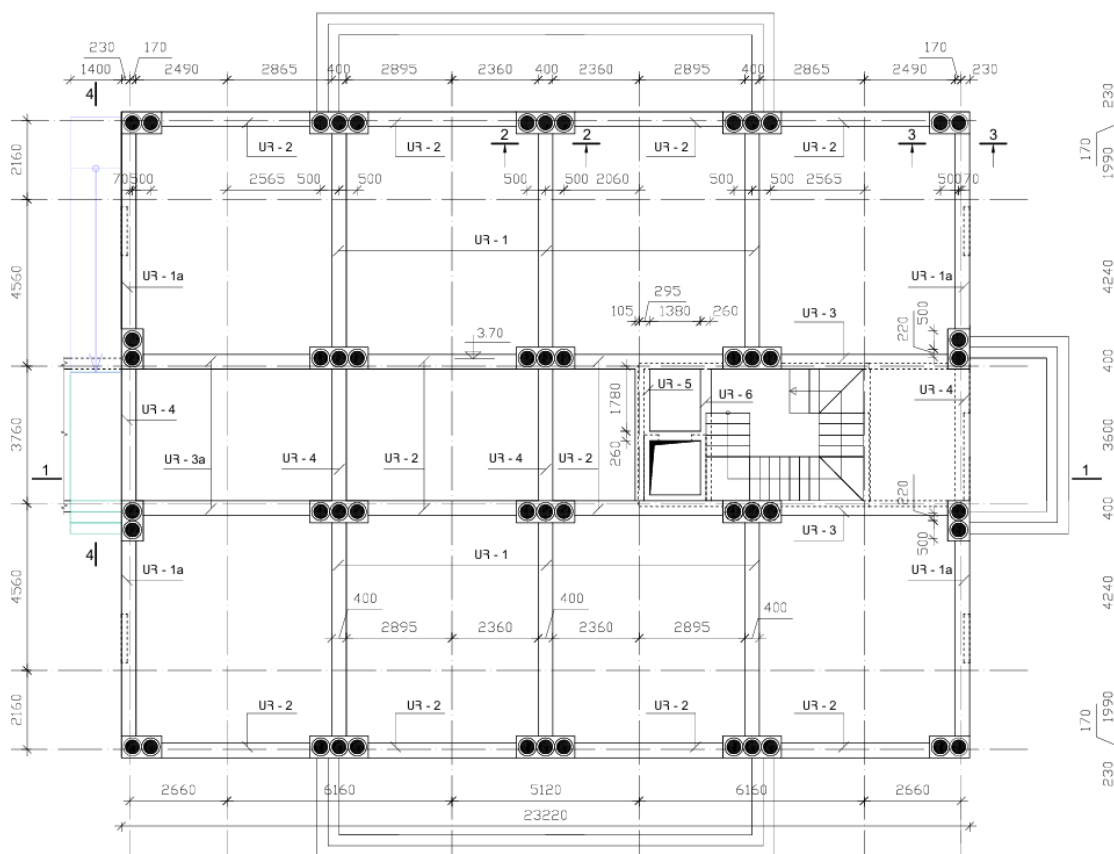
Architectural design view of the of 9-story large-panel residential building with the first business floor
